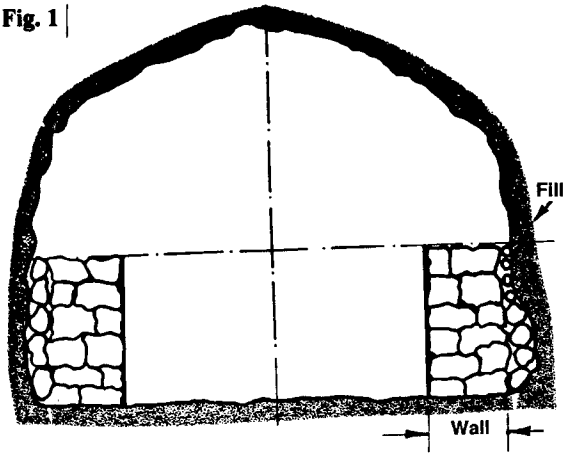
A cross-section of an excavated tunnel, showing the lower walls in place.
